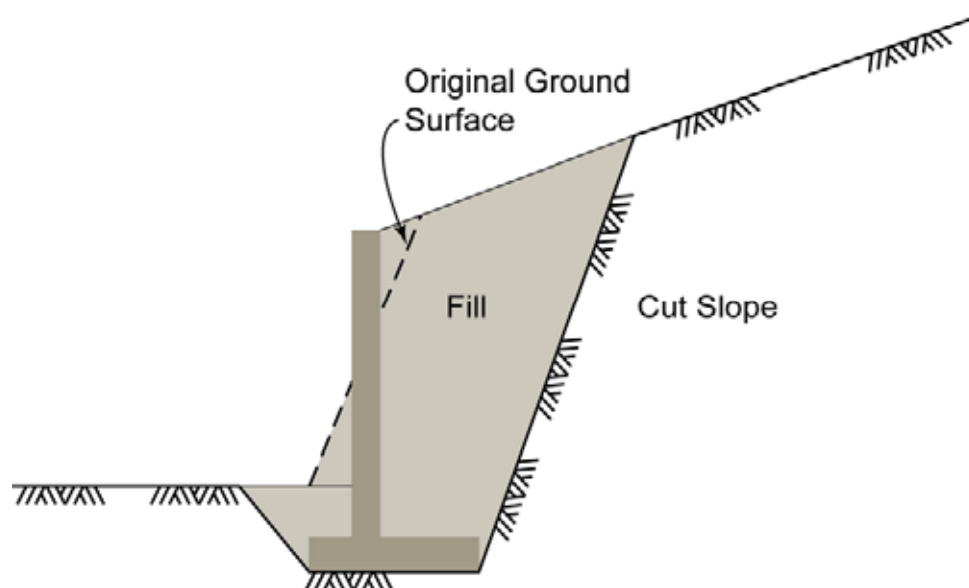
Typical Cross-Section of Semi-Gravity Retaining Wall next to Steep Cut Slope
